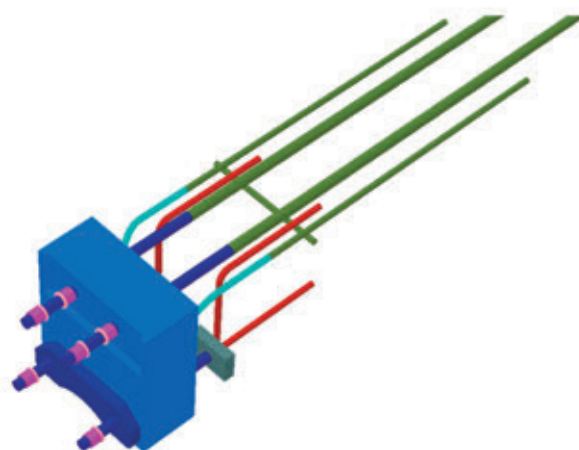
The KS14 unit SOLIDO model (surrounding construction omitted for clarity)
